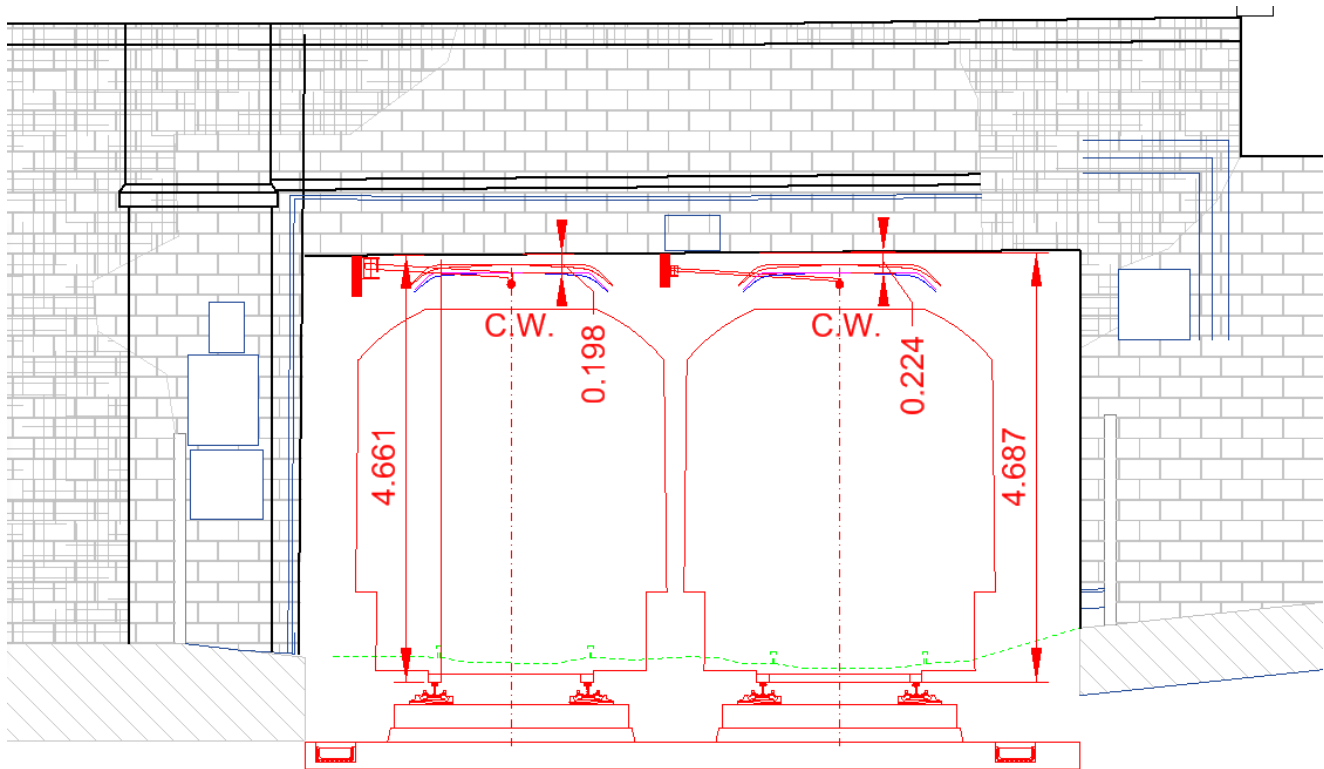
Example cross section for fitted OHLE system in twin area - Facing North
